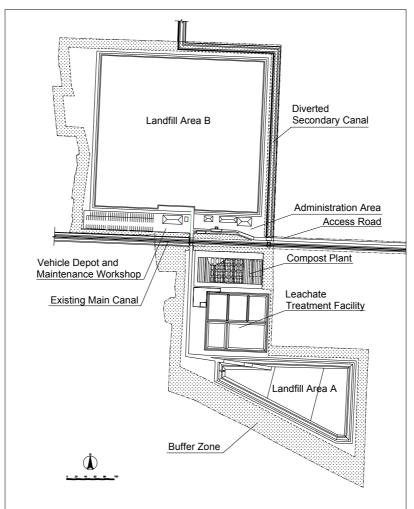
Layout Plan of Dang Kor Disposal Site (Phase1)
